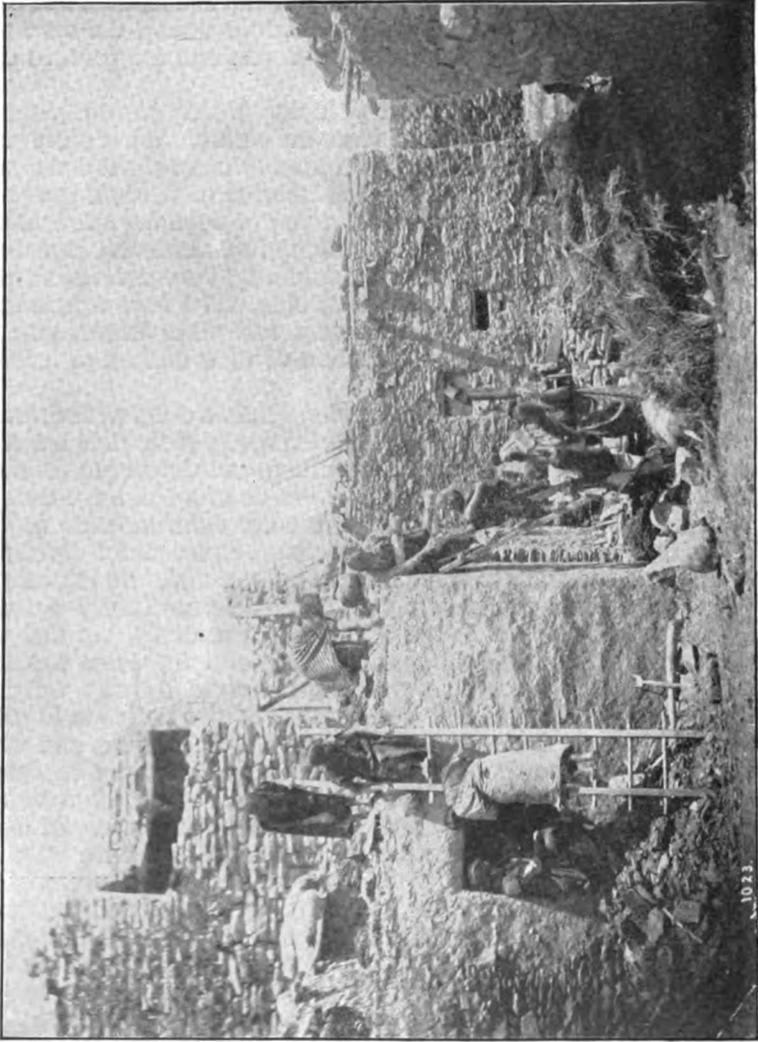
HOPI WOMEN BUILDING A HOUSE.
